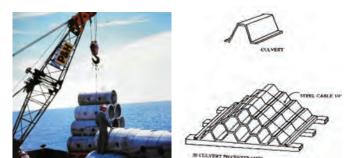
Concrete culvert ARs: cylinder (*left*) and V-shaped (*right*)
